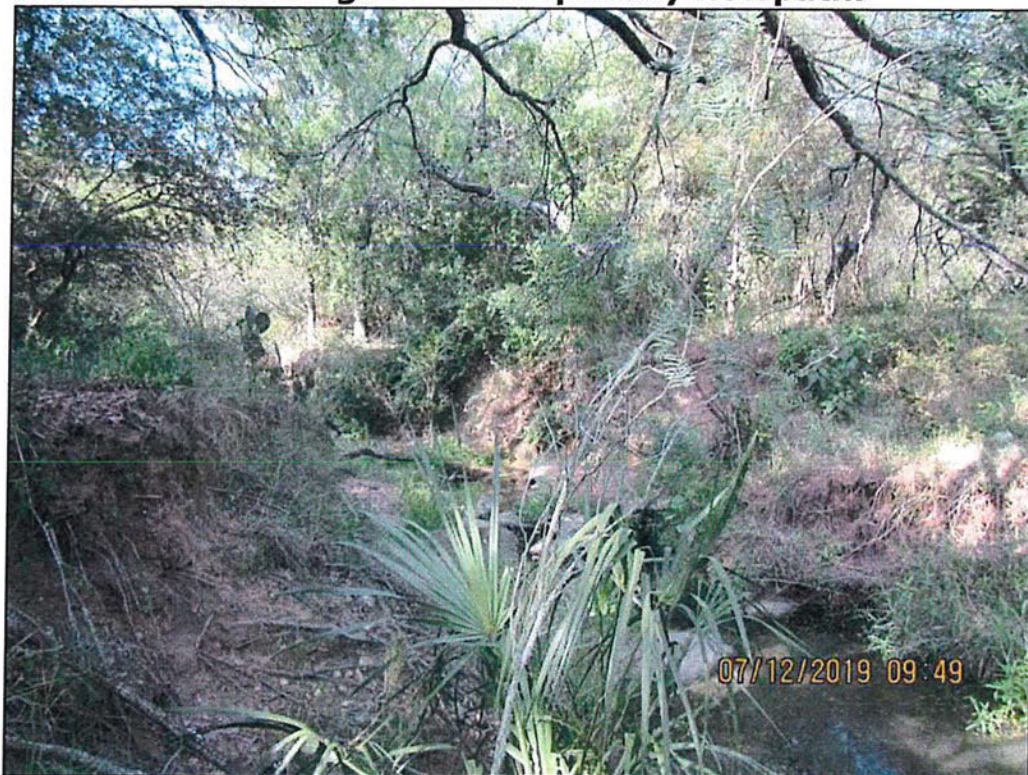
Service spillway. At downstream end. Undermining erosion probed to 4.5 feet.
